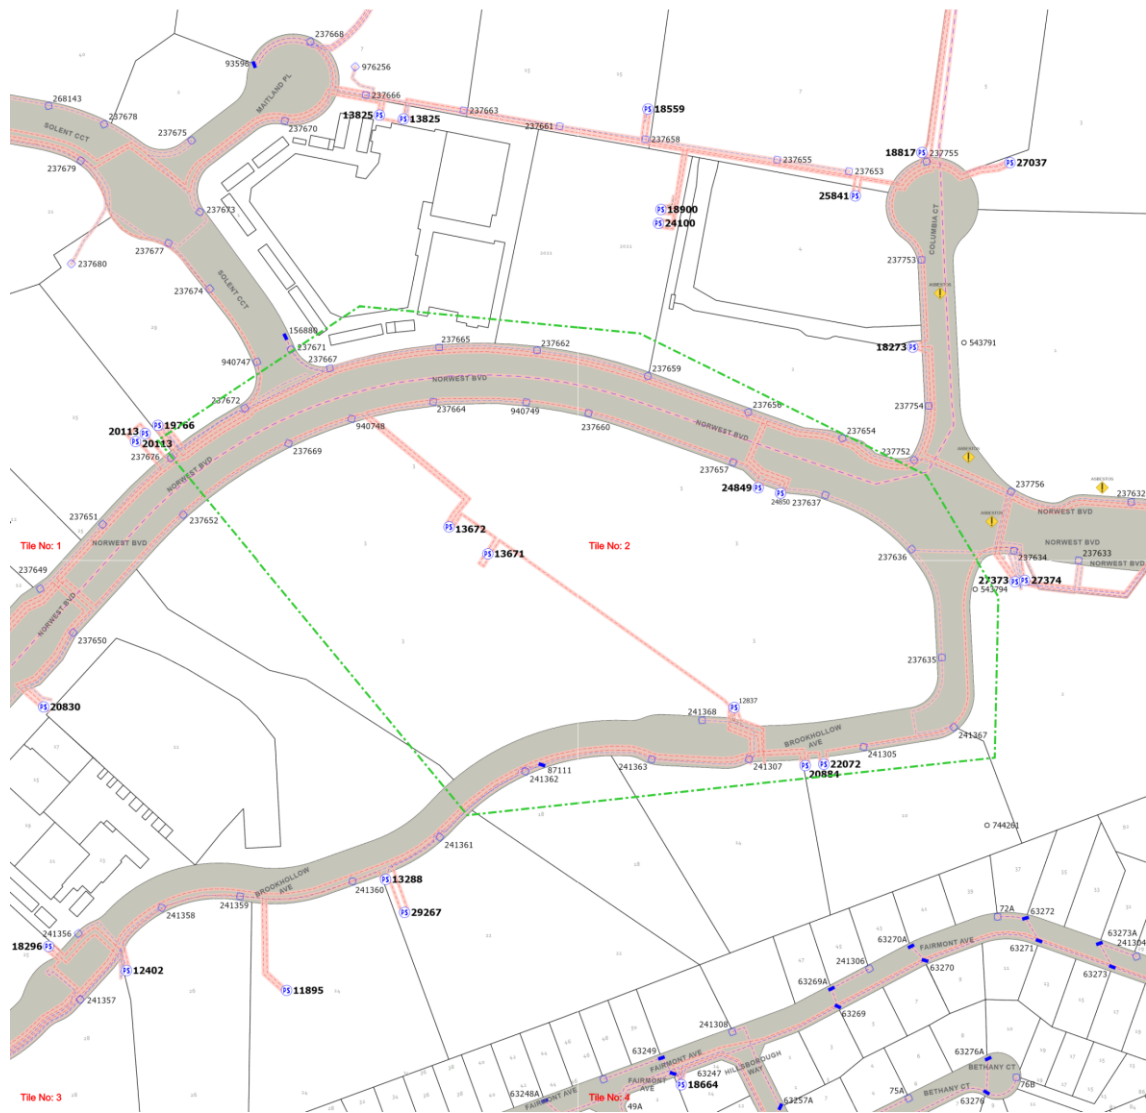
Before You Dig Australia Plan for Site - Electrical
